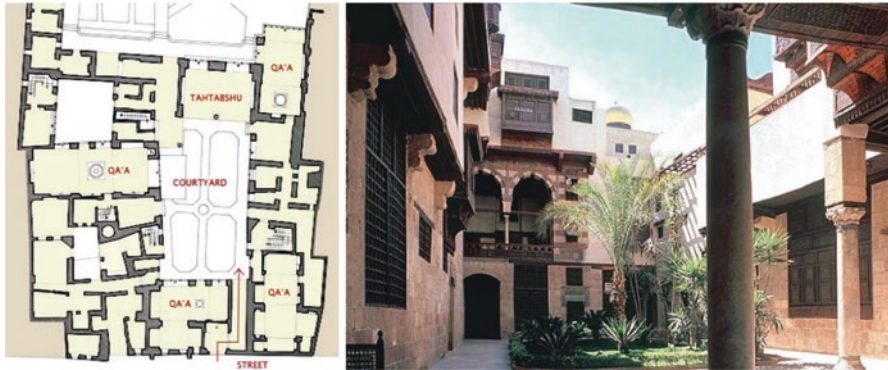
The courtyard in a vernacular house “a plan and a photo.” (Source: [13])
